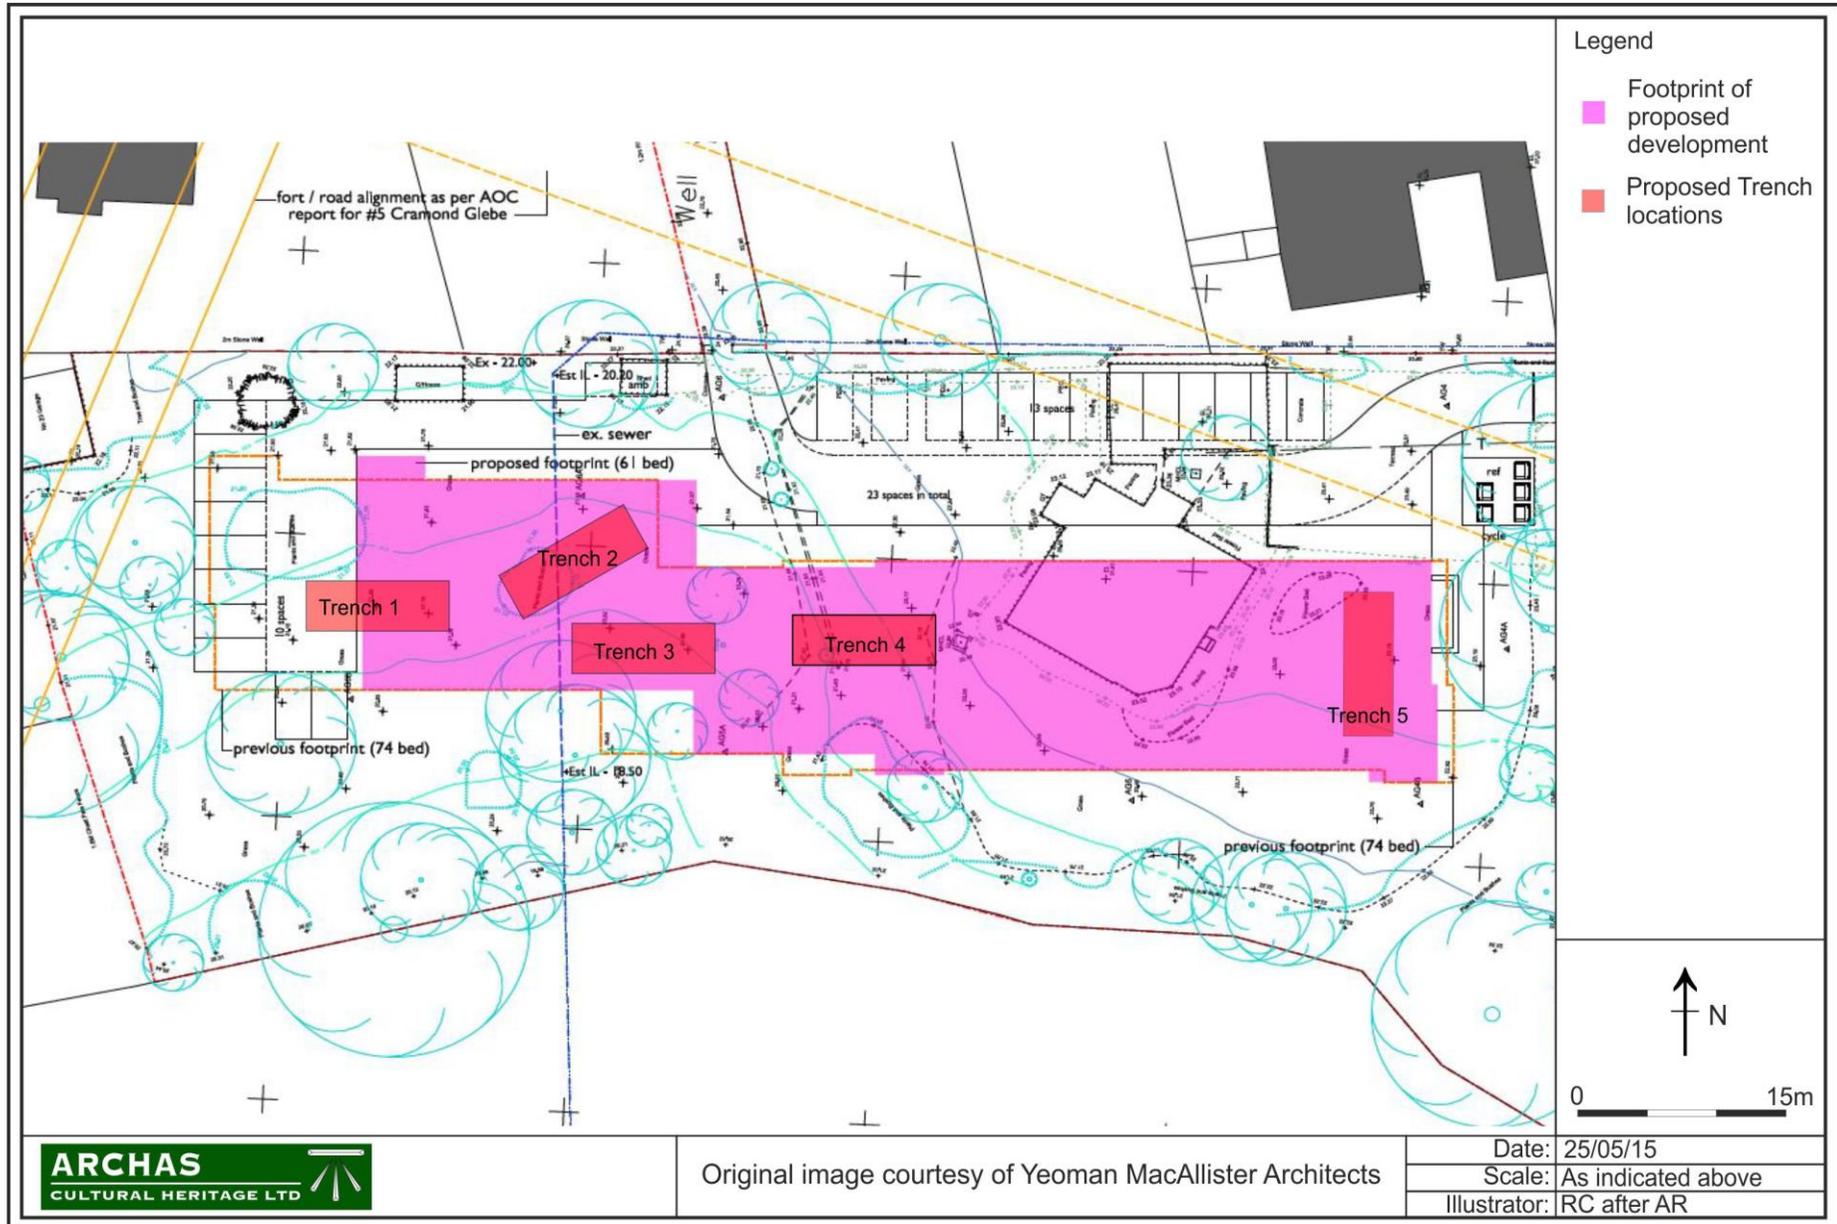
Proposed indicative trench plan. ARCHAS after Yeoman MacAllister
